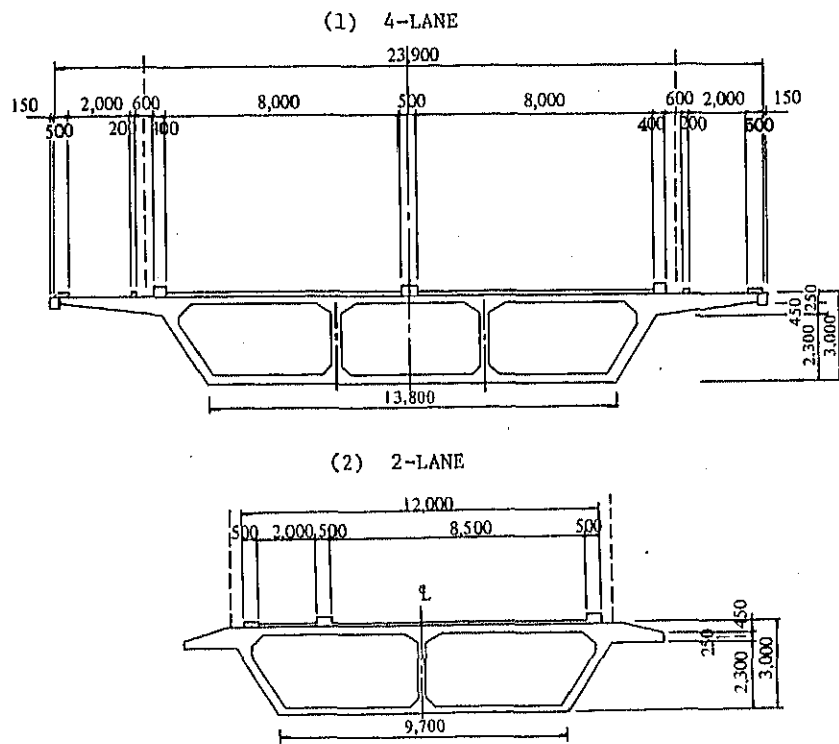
CORSS SECTION OF P.C. GIRDER
